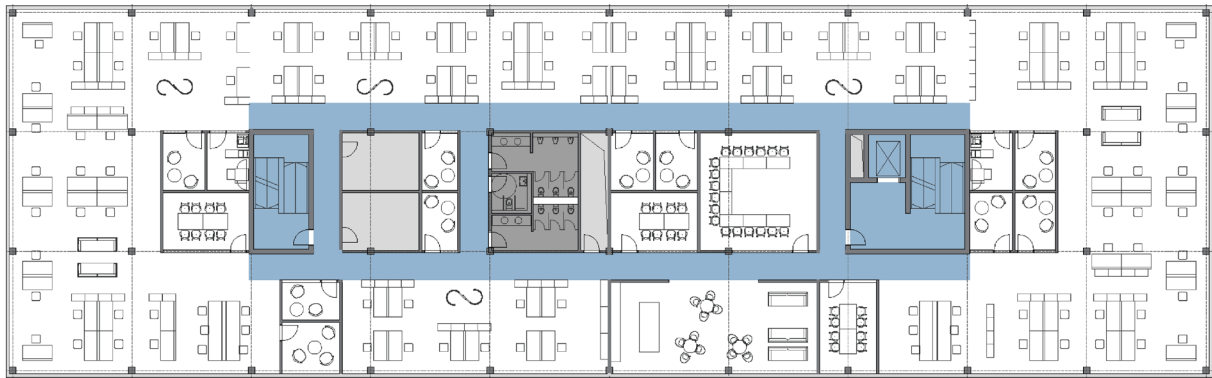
Floor plan with possible space layout design and furniture (based on [85])
